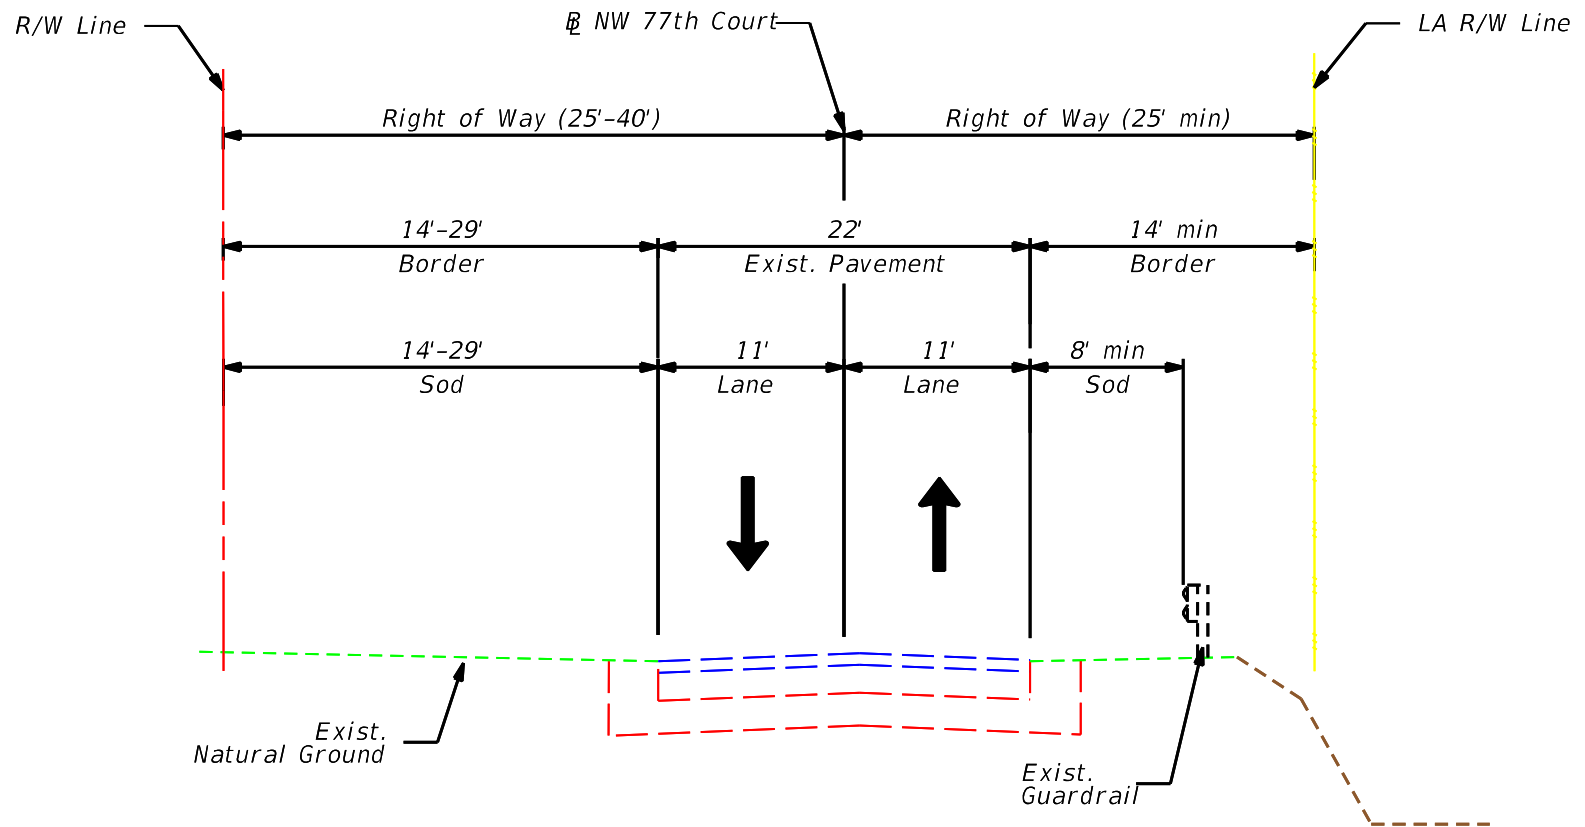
Existing Typical Section NW 77th Court from MP 0.385 to MP 0.696
